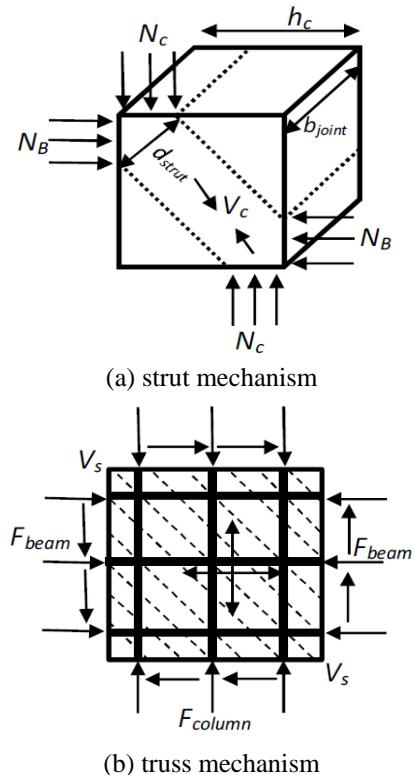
Shear force transfer mechanism of a typical interior beam-column joint
